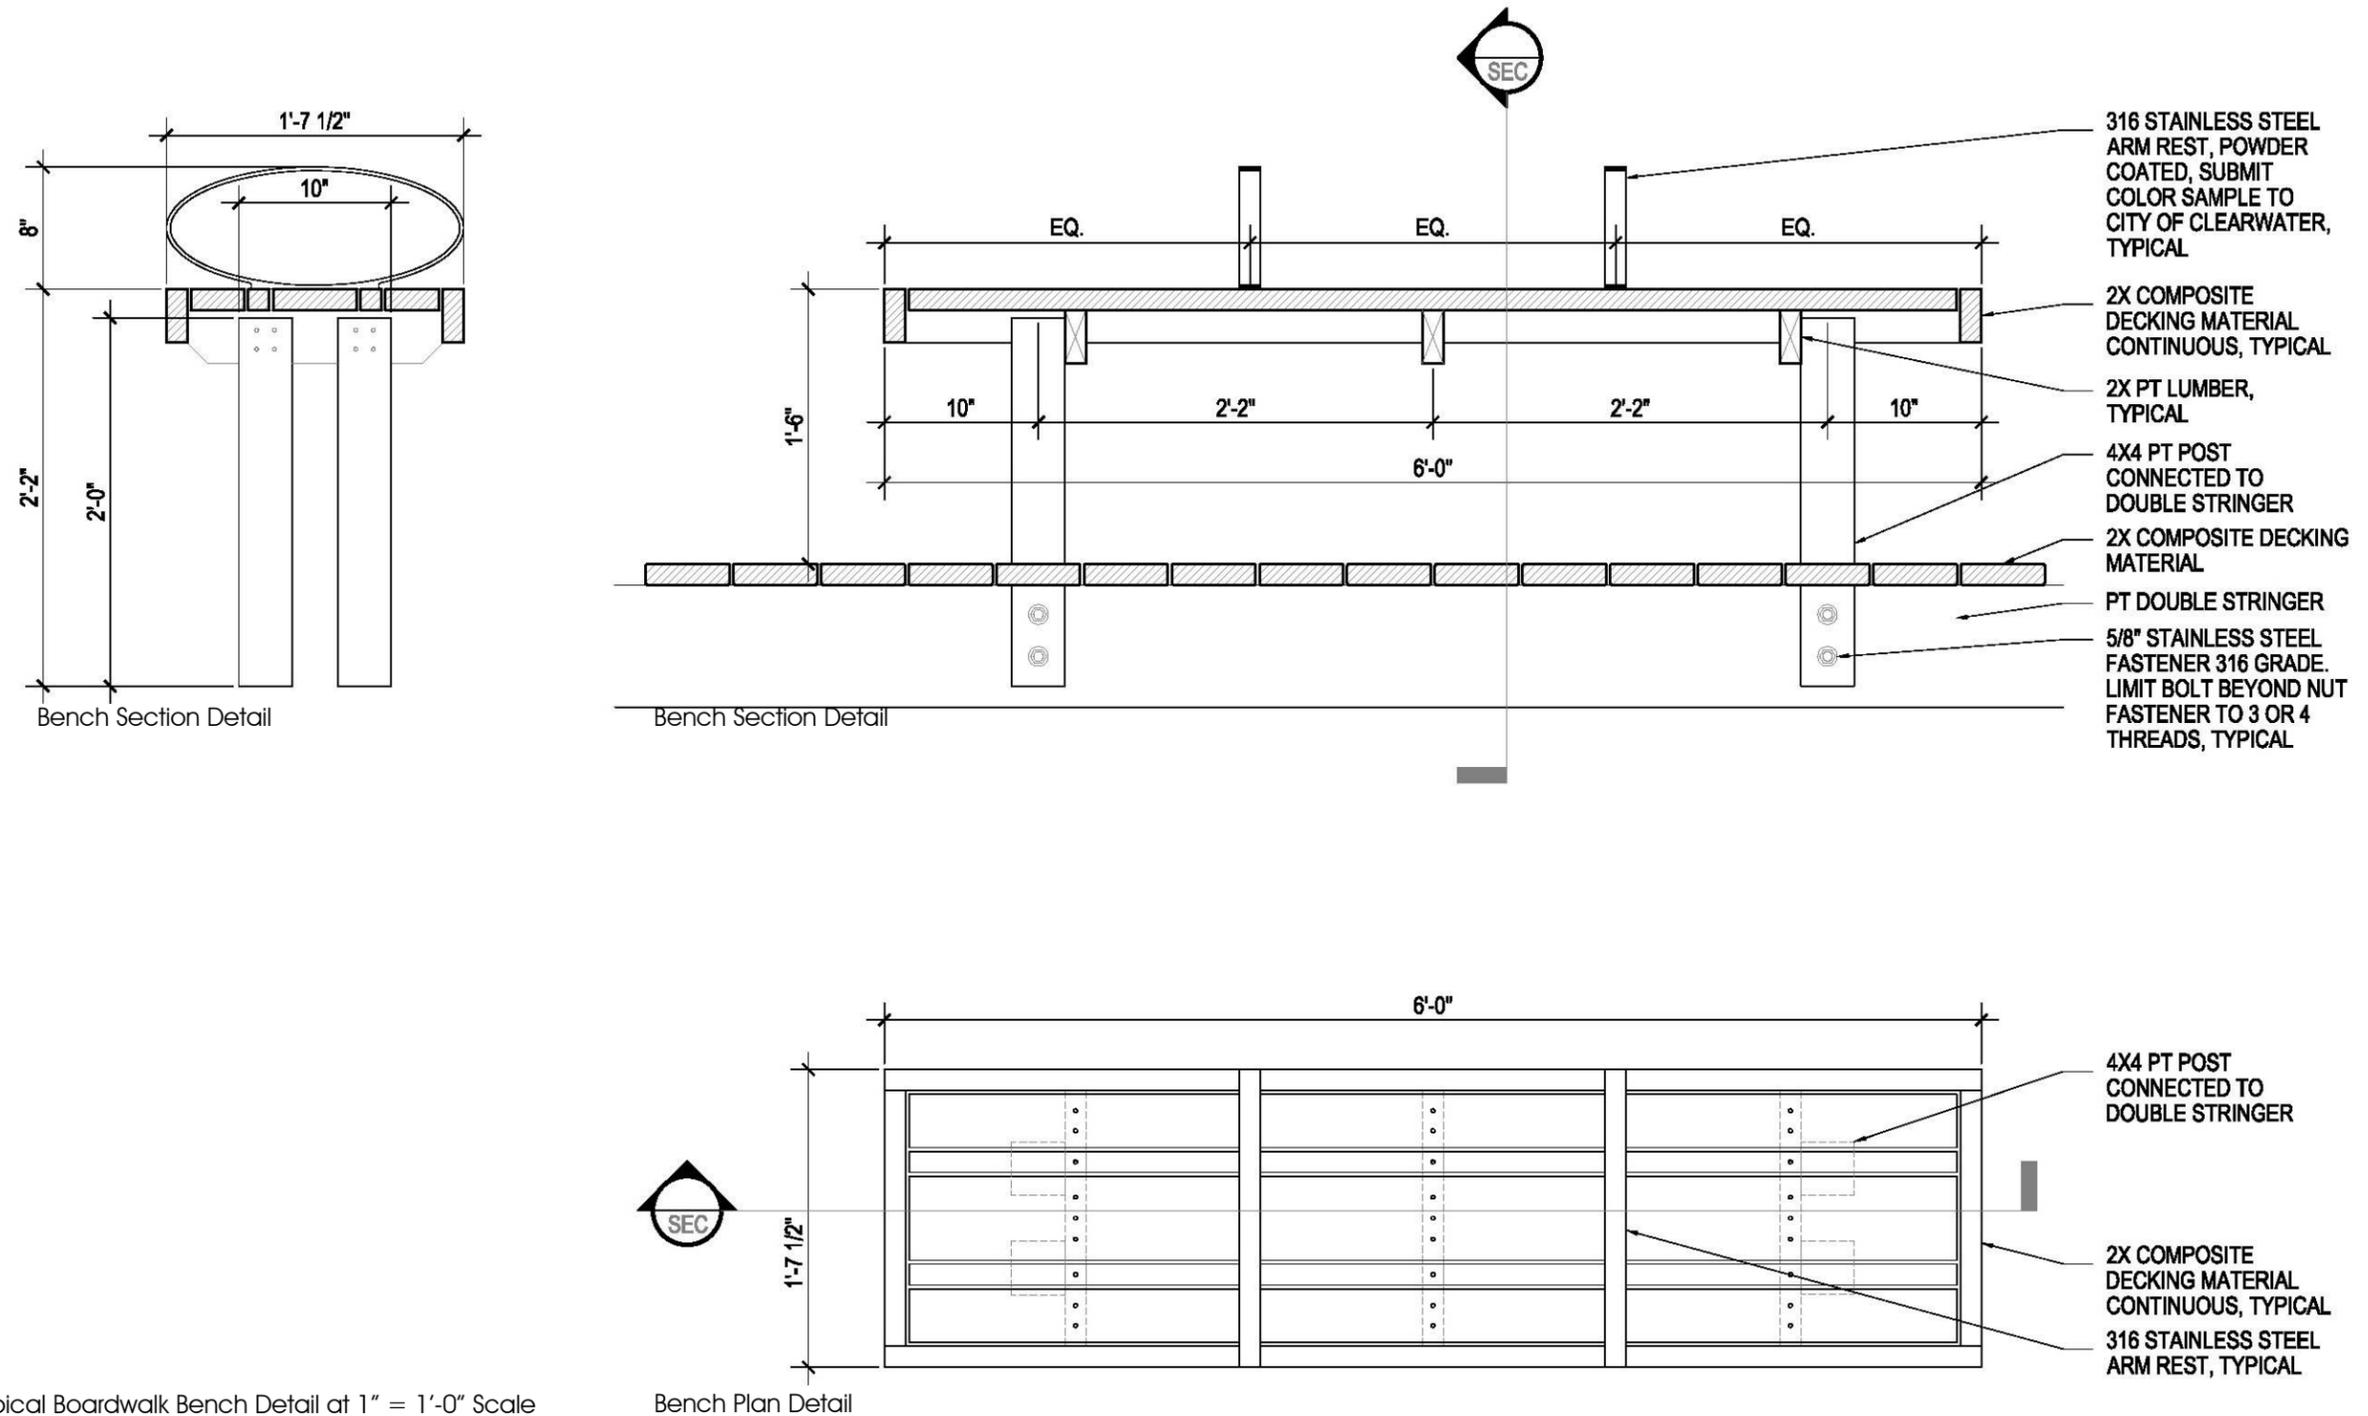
Typical Boardwalk Bench Detail at 1" = 1'-0" Scale
